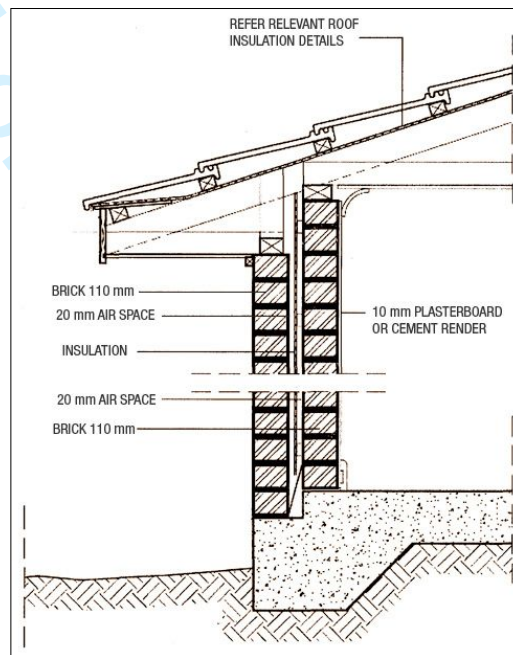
Typical building envelopes (Double Brick Cavity Wall, thermal floor, and Roof)
